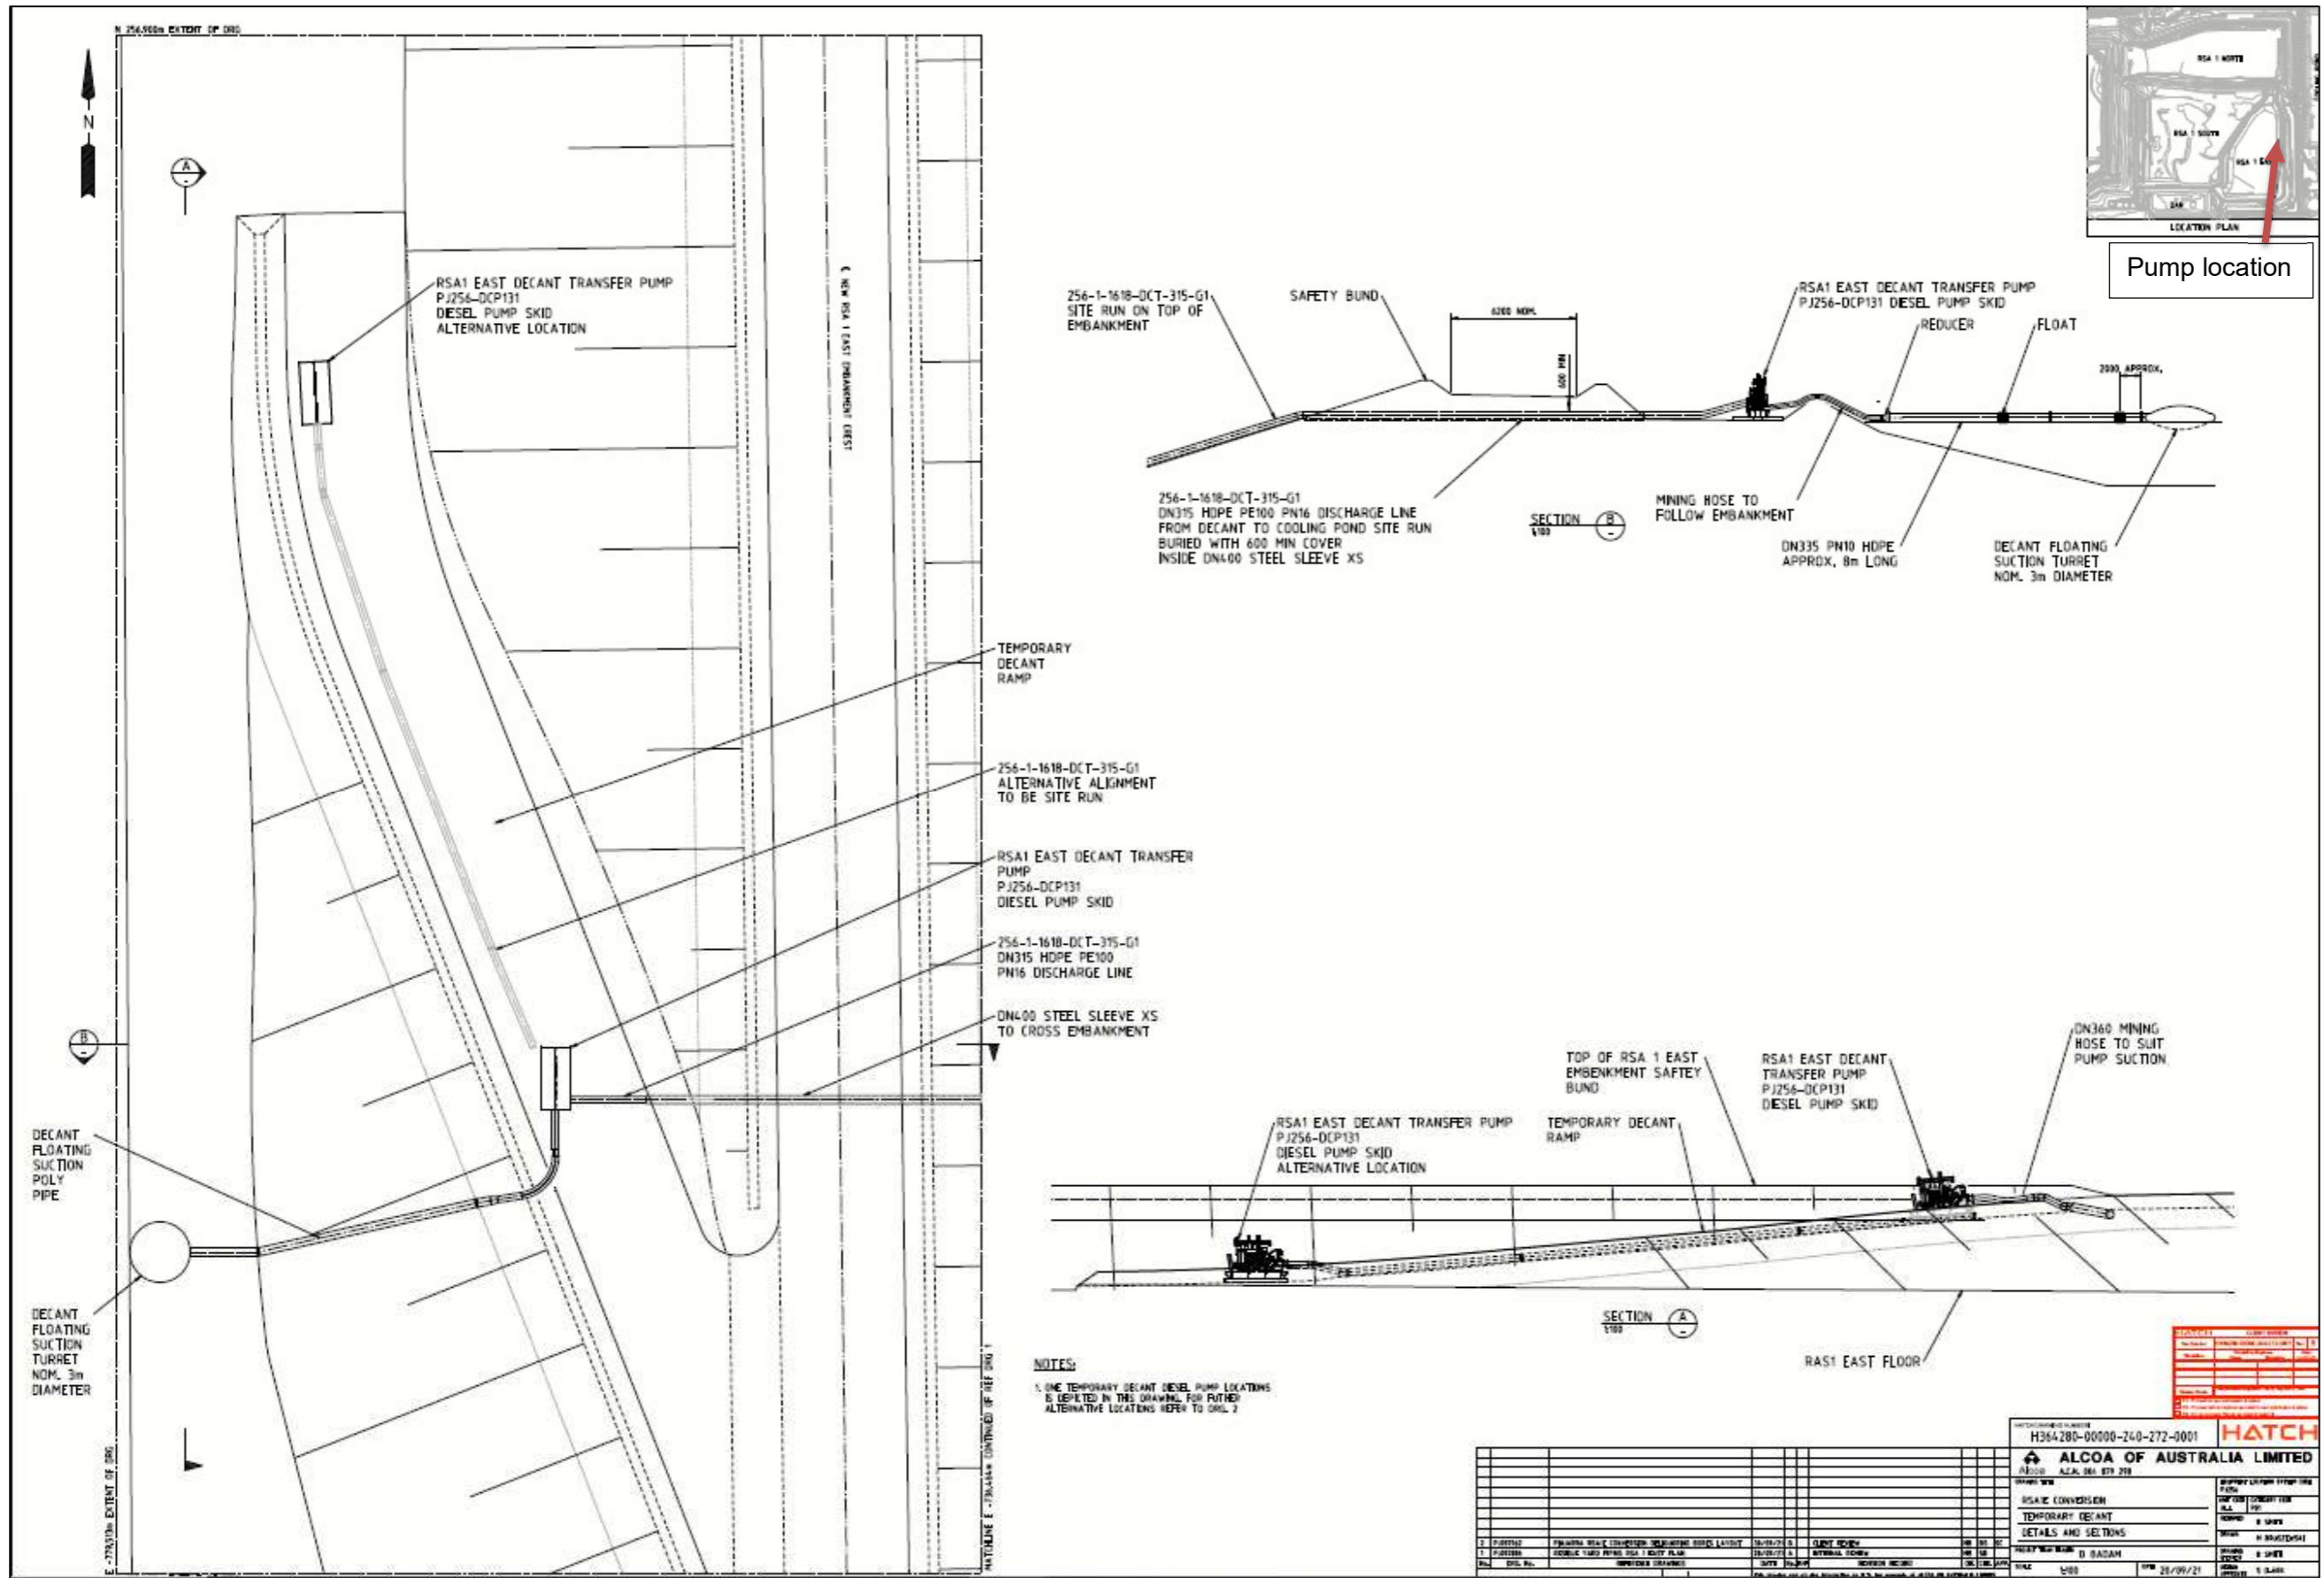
Above ground decant pump – construction details and location (drawing number PJ097884 – Rev B)
